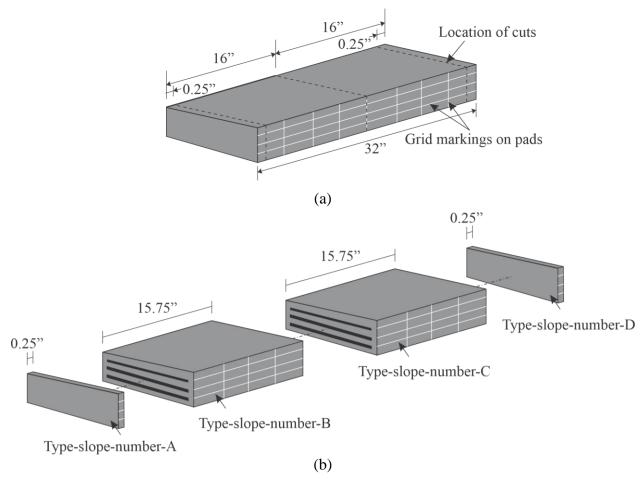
Bearing pad dissection schematic: (a) location of cuts; (b) dissected component labels
